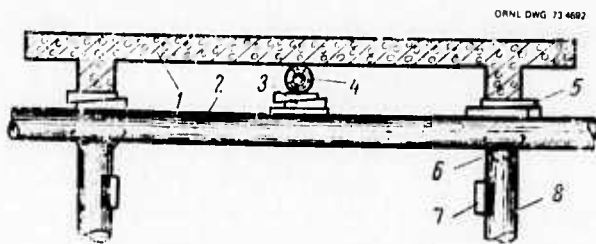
Reinforcing ribbed ceilings: (1) plate; (2) lining; (3) beam; (4) girder; (5) shims; (6) brackets; (7) interlock; (8) support [column].
